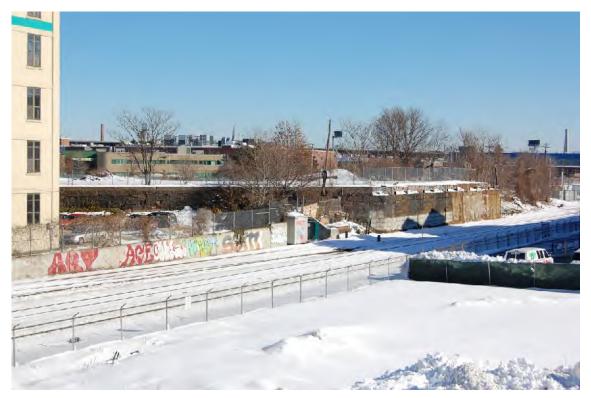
West abutment of the Red Bridge in Somerville, looking west, with the MBTA Fitchburg Line in foreground. Portion of wall at left is from 1883, portion of wall at right is from 1925.
